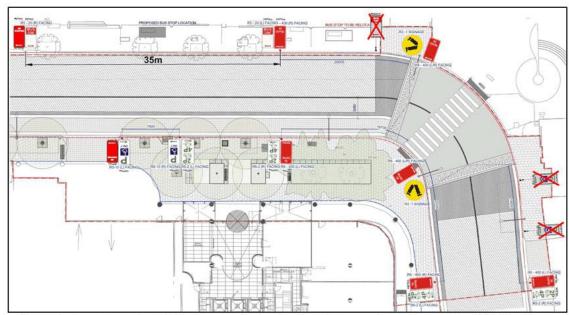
A concept plan of the proposed raised pedestrian crossing at the corner of Phillip Street and Charles Street, Parramatta
